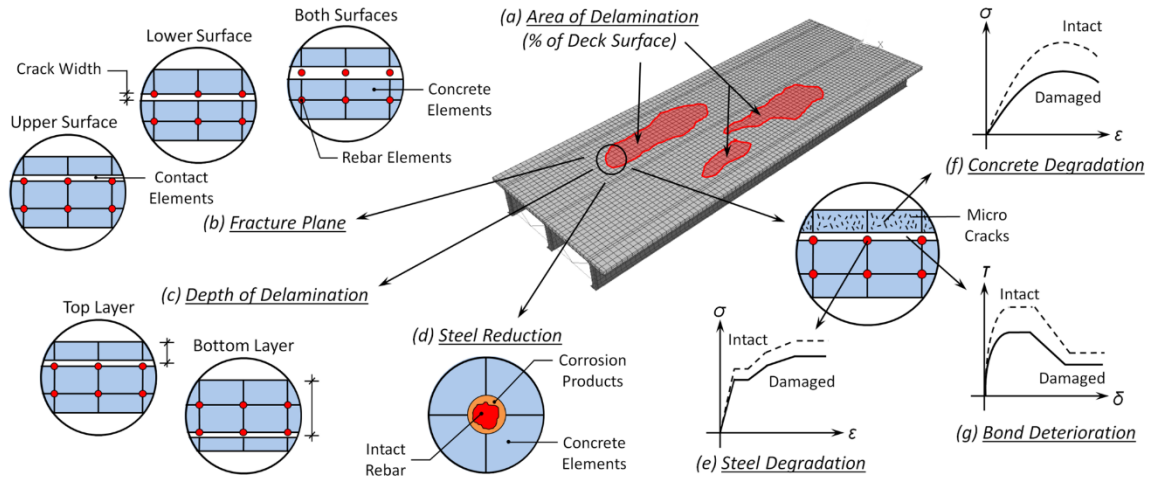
FE model development to simulate delamination in reinforced concrete slabs
